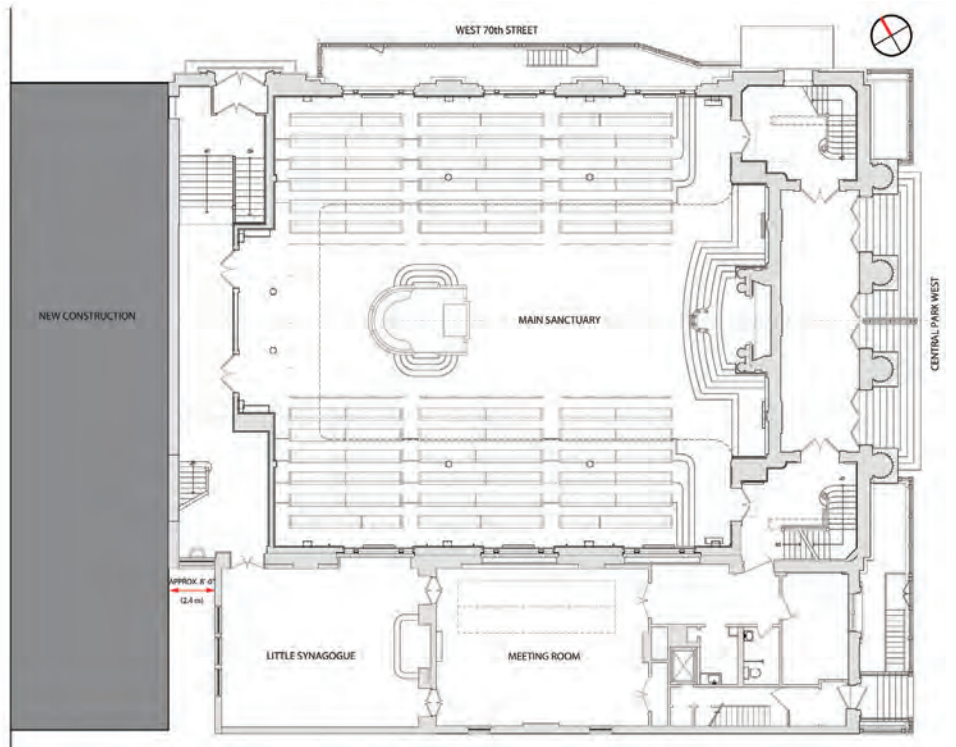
First-floor plan, 2014. The new construction, which replaced the community house, is approximately 8 feet (2.4 m) distant from the west windows of the Little Synagogue. Drawing by PBDW Architects, 2014.
